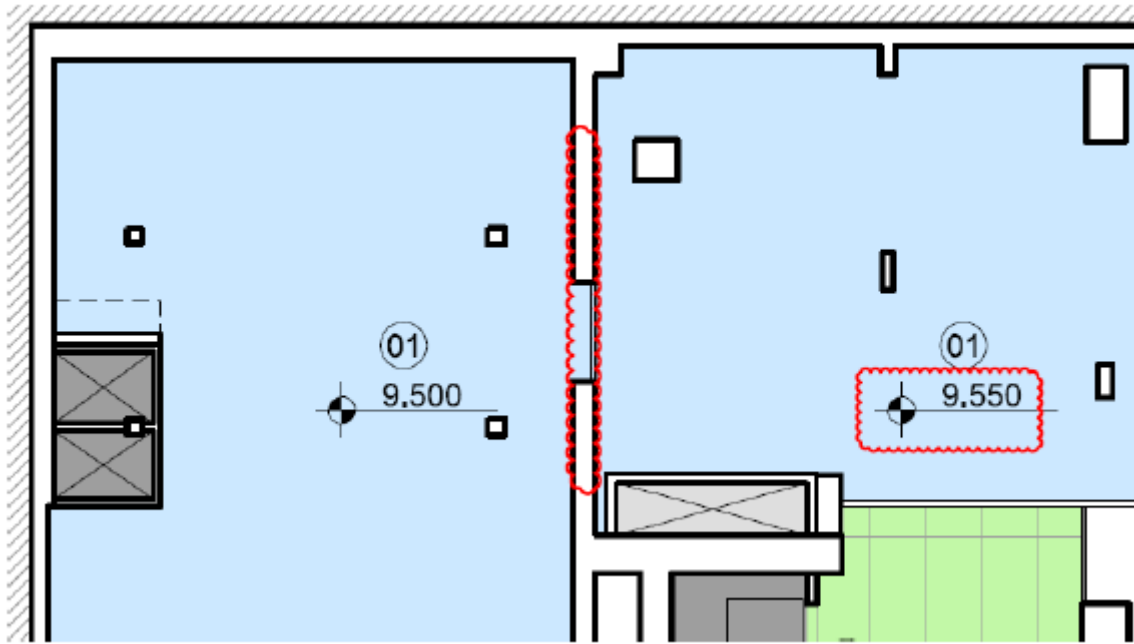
| Proposed minor amendment to 285 George Street floor level interface with tower
